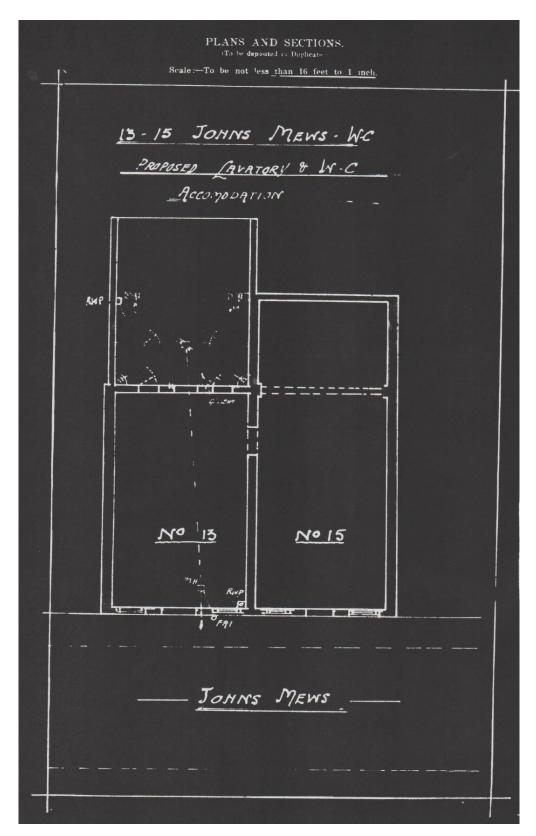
A plan of 13-15 Johns Mews in 1921, apparently at first floor level (Camden drainage records).
